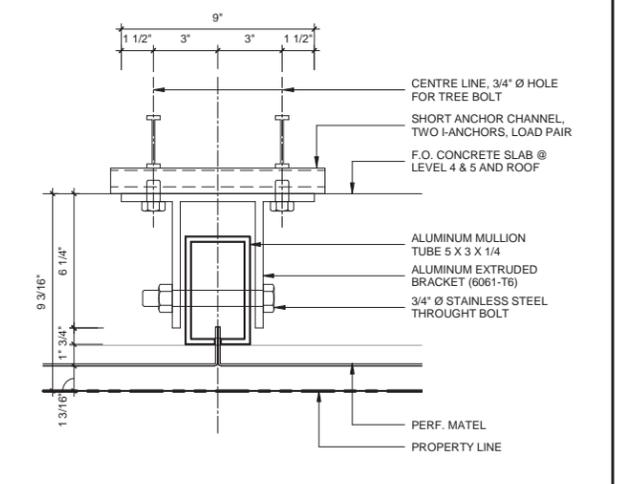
DETAIL SECTION LEVEL 4 5 & ROOF 3/4" = 1'
